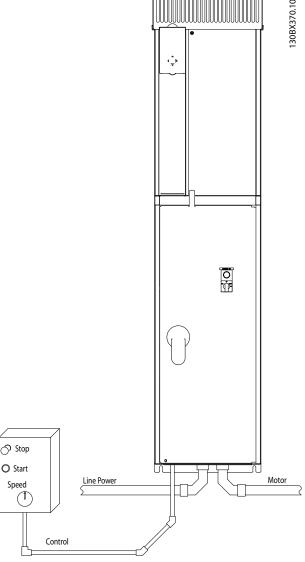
Example of Proper Electrical Installation Using Conduit
